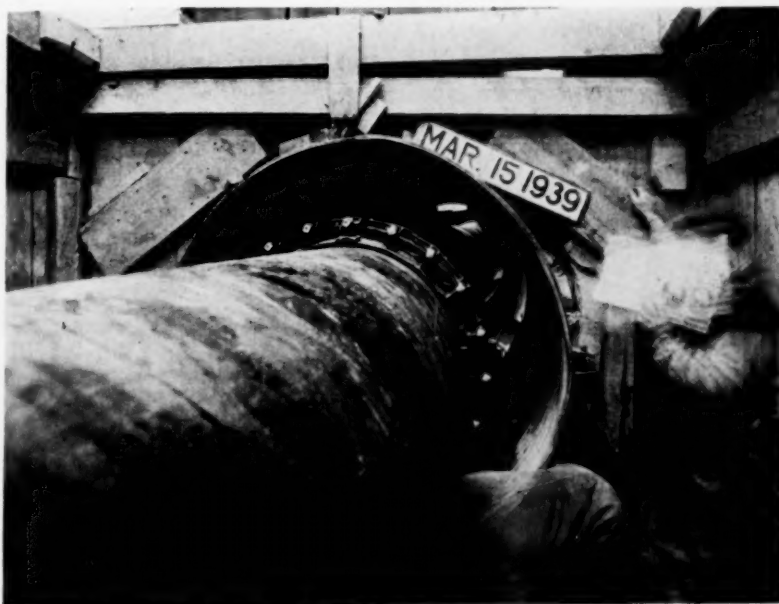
The 36-Inch Cast-Iron Main Installed in the Culvert Pipe; note pipe joint clamps
